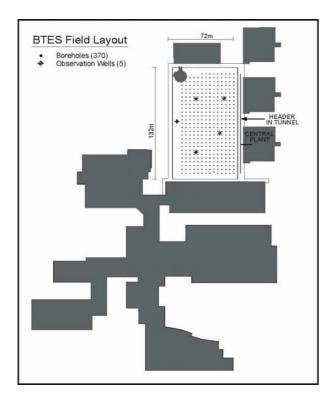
UOIT/Durham College Campus and BTES Field Layout
